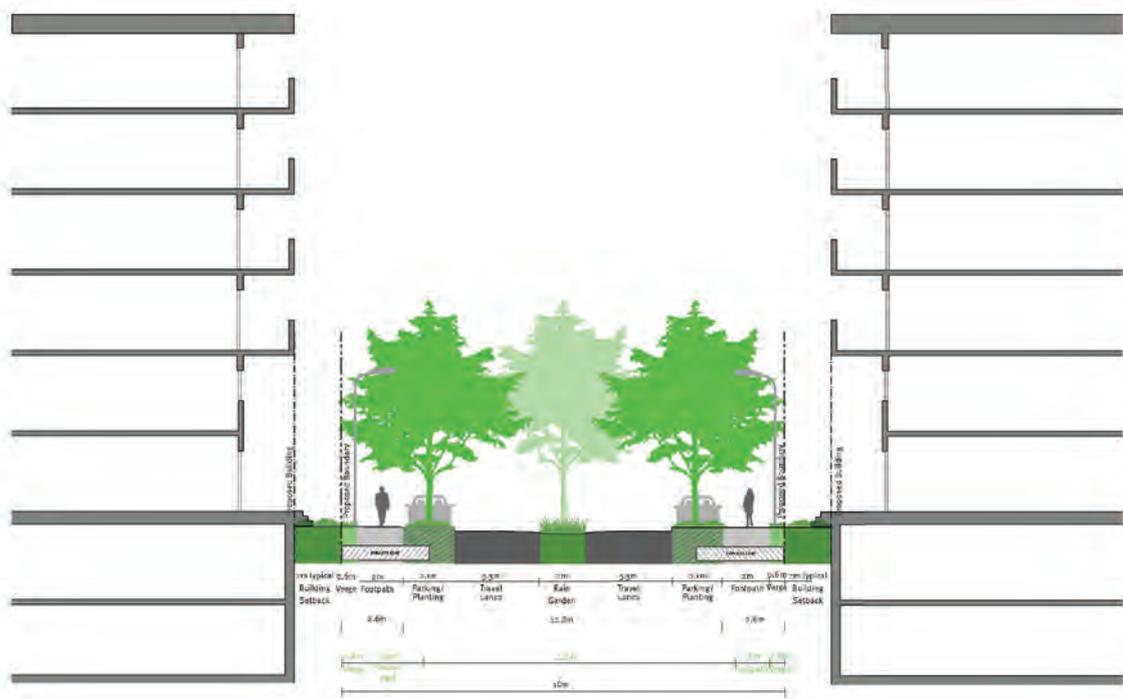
Indicative Street Section (Service Street and Local Street, 18m)
